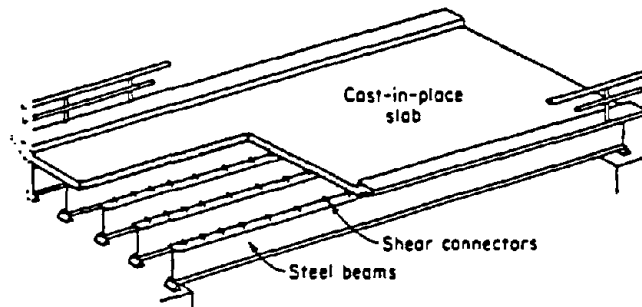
Composite Steel-Concrete Bridge (Winter & Nilson 1979)
